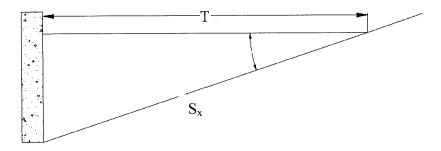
Uniform Cross Slope Section (Johnson and Chang 1984)
